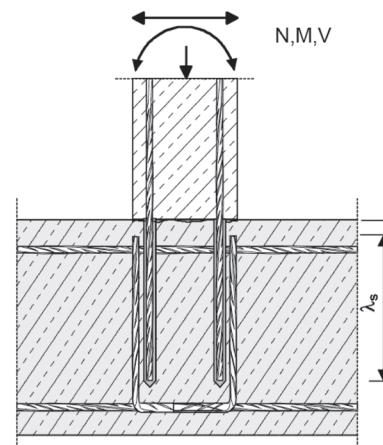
Bond superimposed to a foundation of a column or a wall where the rebars are subjected to tensile force.
